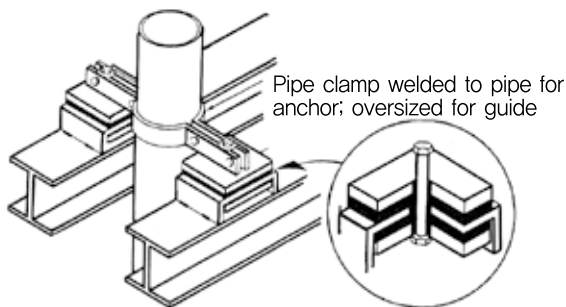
Acoustical Barriers For Pipe Anchors and Guides
